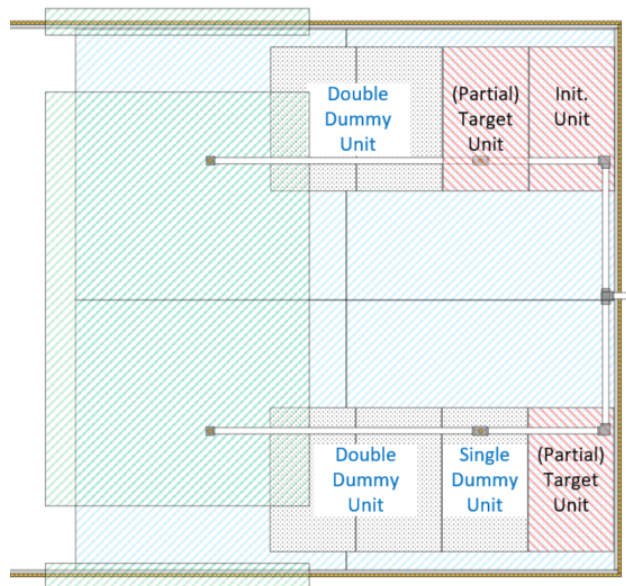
Nozzle arrangement above ESS unit enclosures, plan view.
